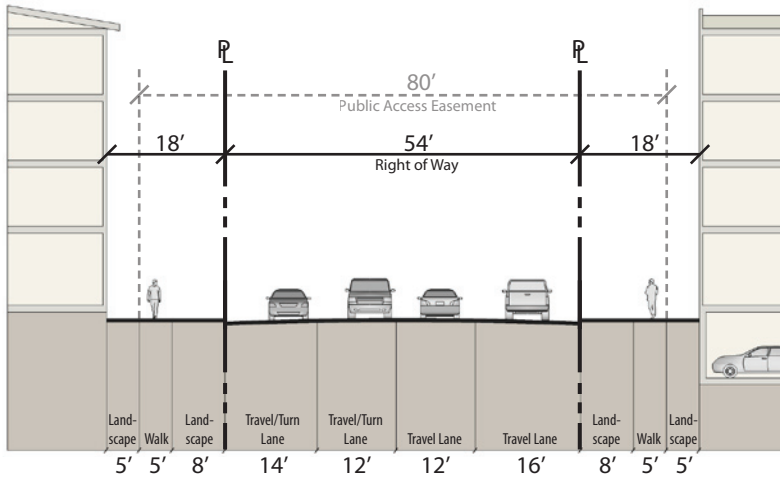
Section C - Entry Drive (without diagonal parking)
